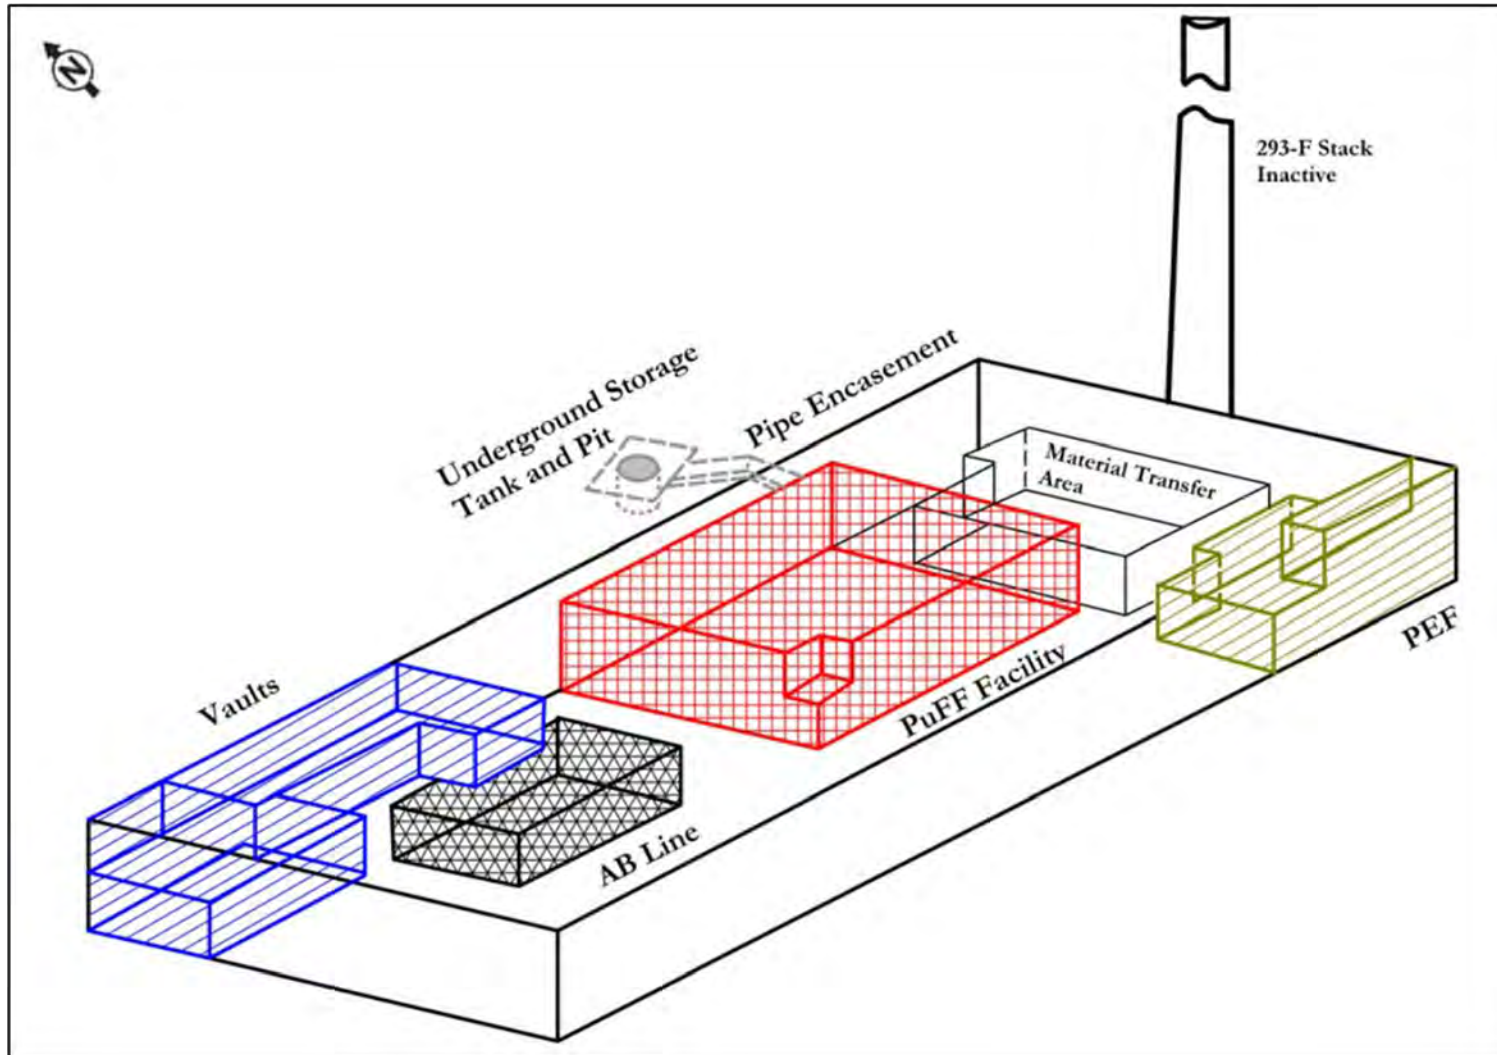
Conceptual View of Building 235-F First and Second Level Process Areas
